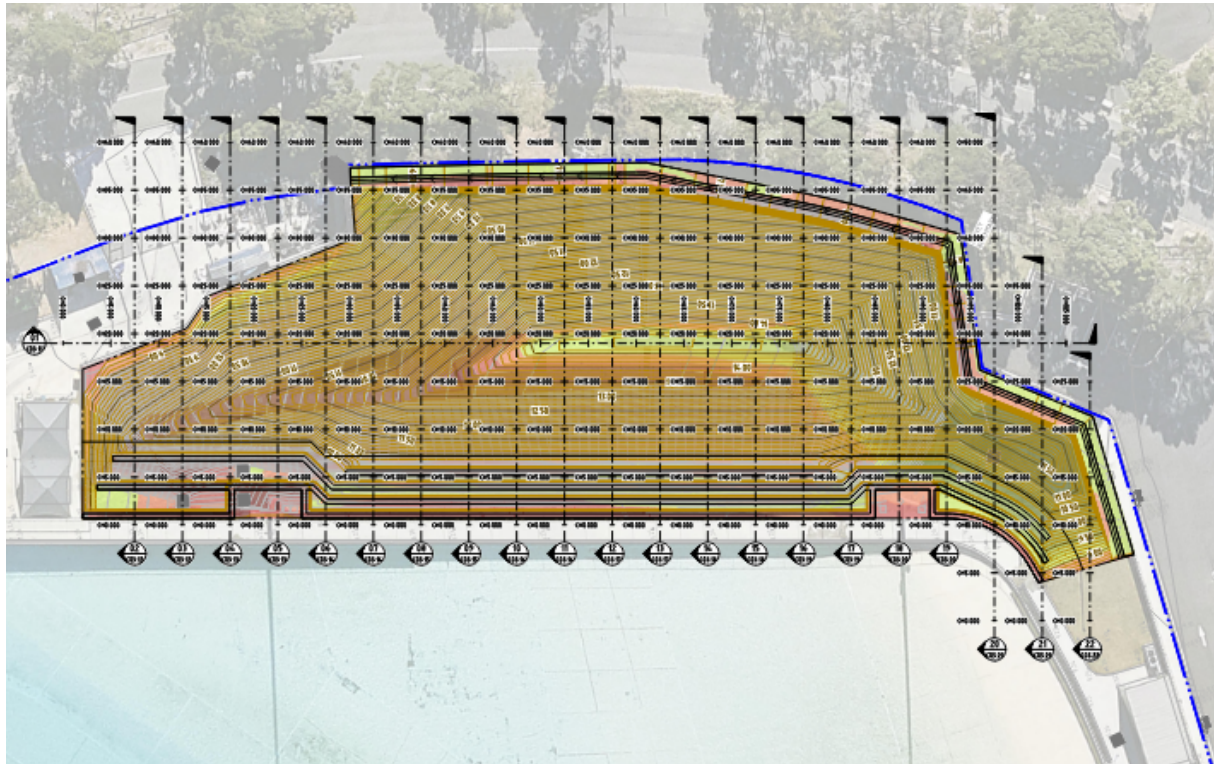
Site Plan Showing Different Sections (NORTHROP, 2026)
